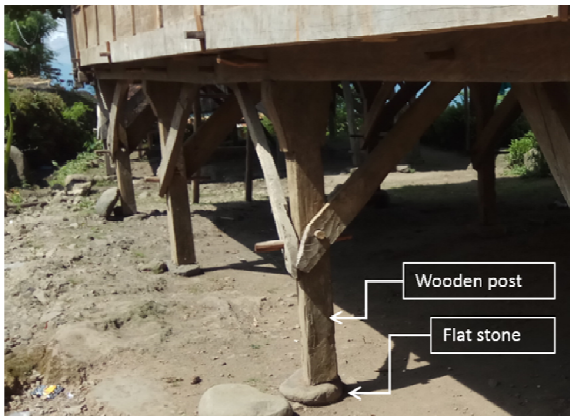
The foundation structure of stilt house: a wooden post placed on a flat stone
